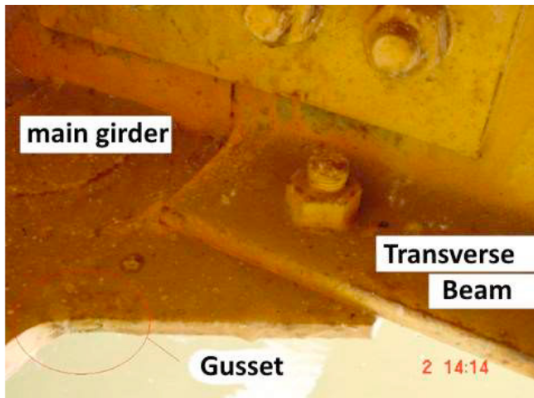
Anti-fatigue rounded gussets (built in 1971 – 1972)
